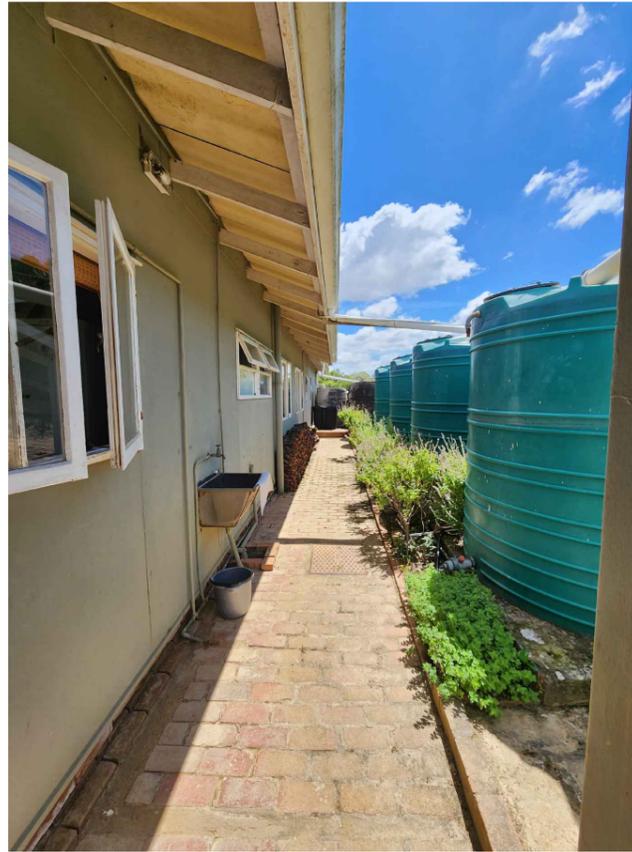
VIEW OF BACK OF EXISTING HOUSE (EAST)
